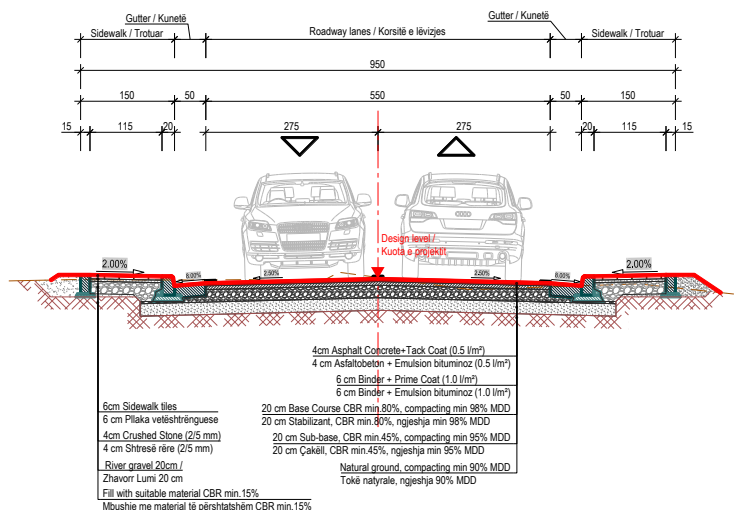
Typical Cross section No. 4. - Urban Local Road "F3"
